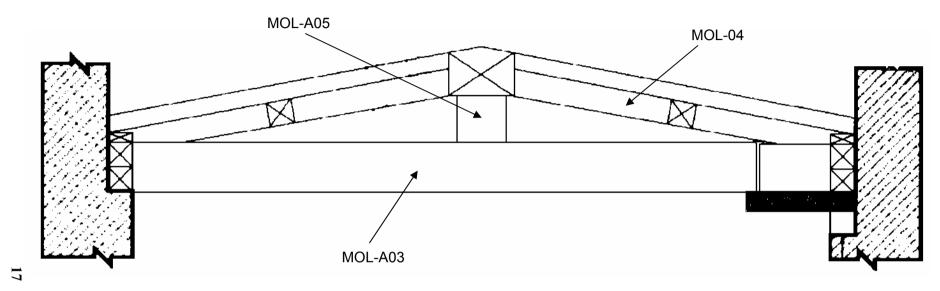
Roof truss, mid truss, showing the location of samples MOL-A03–5 (Hockley and Dawson)
